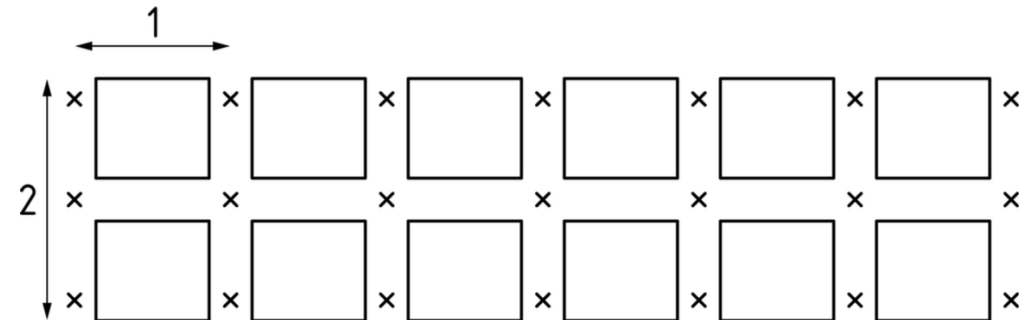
Plan view of modular in-rack sprinkler arrangement for single-row racks up to 1,8 m deep located against a wall
